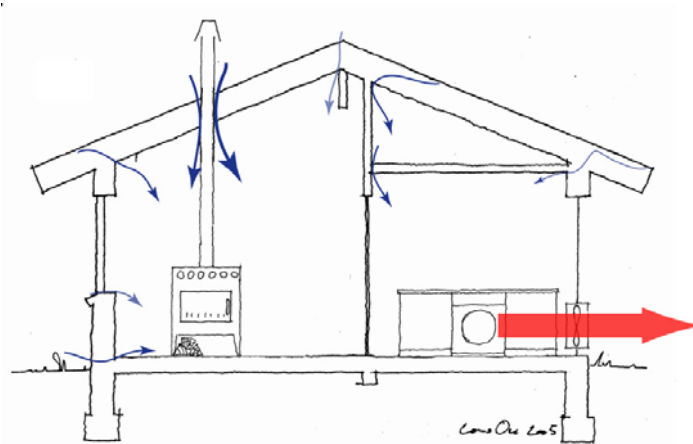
A Blower Door blows the air out or into the building and creates pressure difference between inside and outside. Here is illustrated low pressure in the building.
